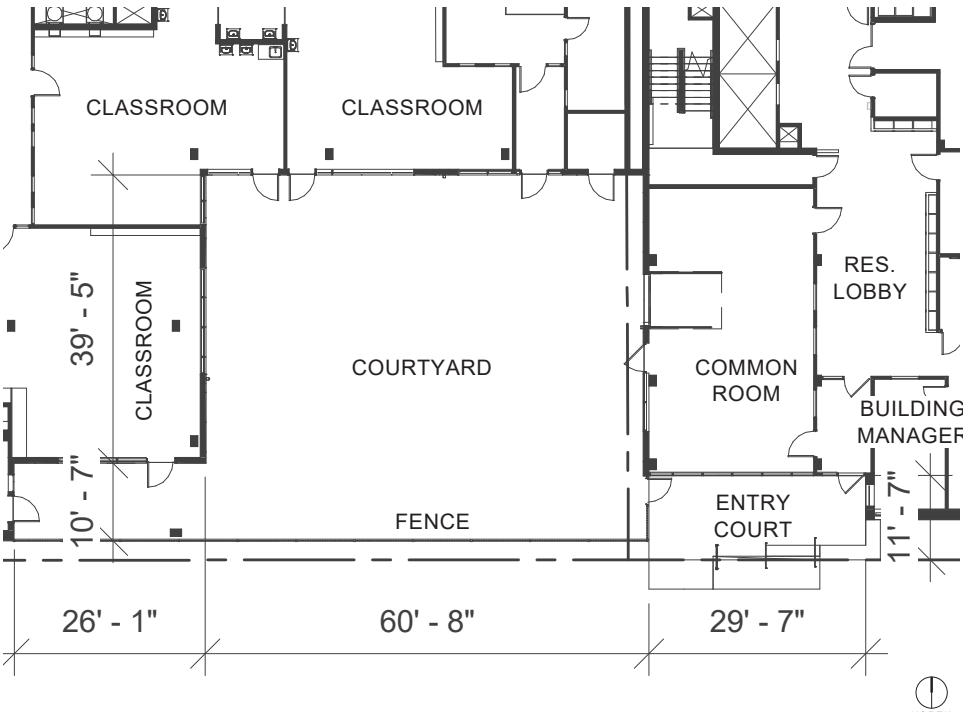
Plan showing entry court, building manager's office, courtyard, and surrounding spaces providing supervision.
